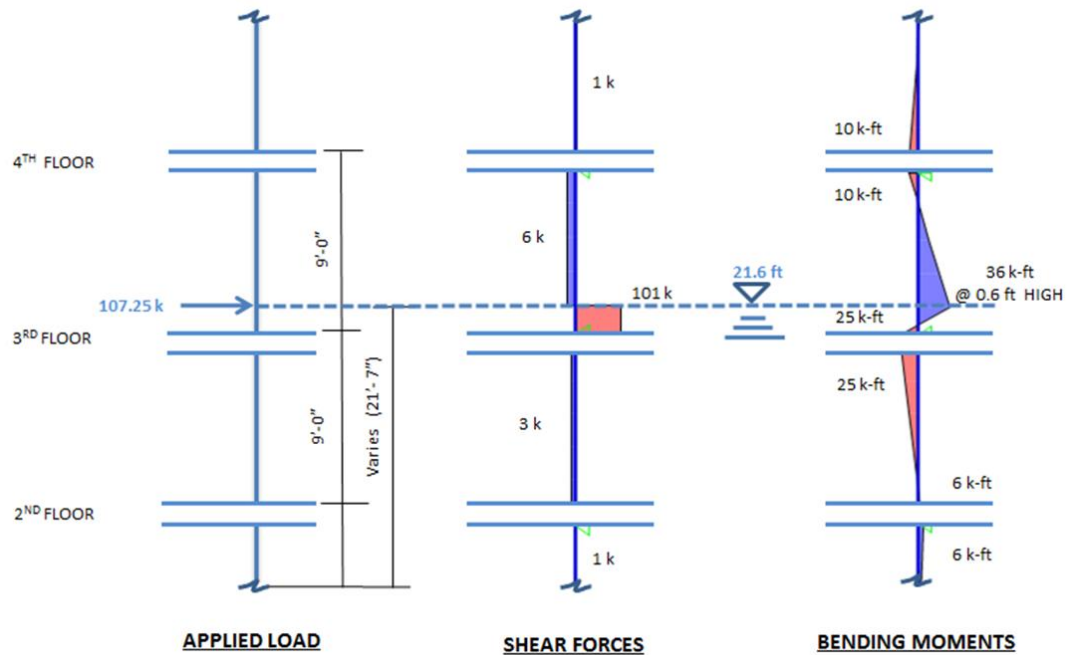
Impact load applied at 0.6 ft away instead of "d" as water level is lower than "d" away from the end of column on the 3rd floor
